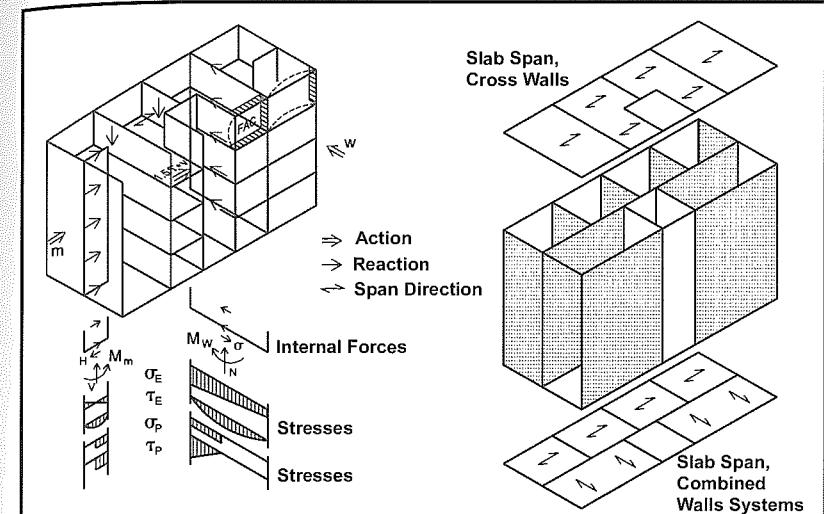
Statical Model Of Panel System For Vertical And Horizontal Forces
